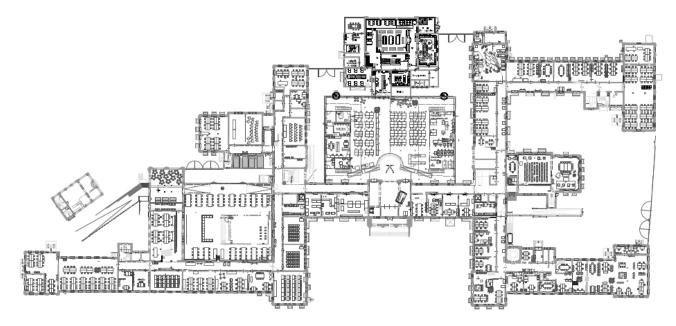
Floor plan of the ground floor of the Faculty of Architecture and the Built Environment
